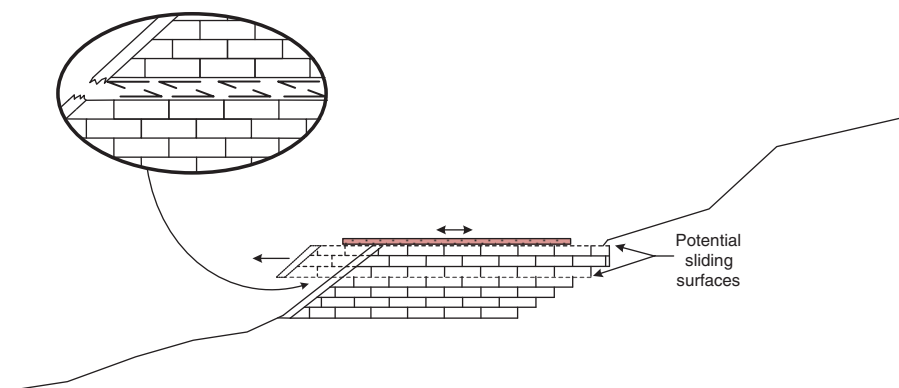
Internal seismic stability failure involving horizontal sliding between blocks and/or between the pavement system and the upper layer of blocks due to seismic loading.
